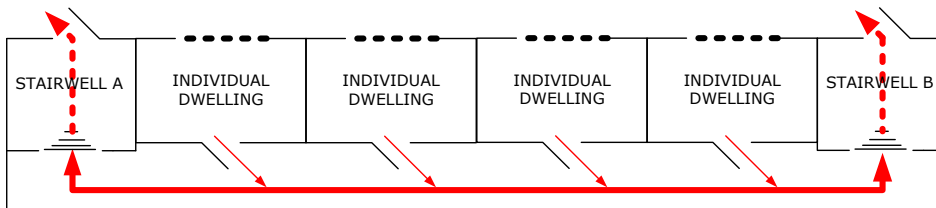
EXAMPLE OF A "COMMON ALTERNATIVE MEANS OF ESCAPE"
